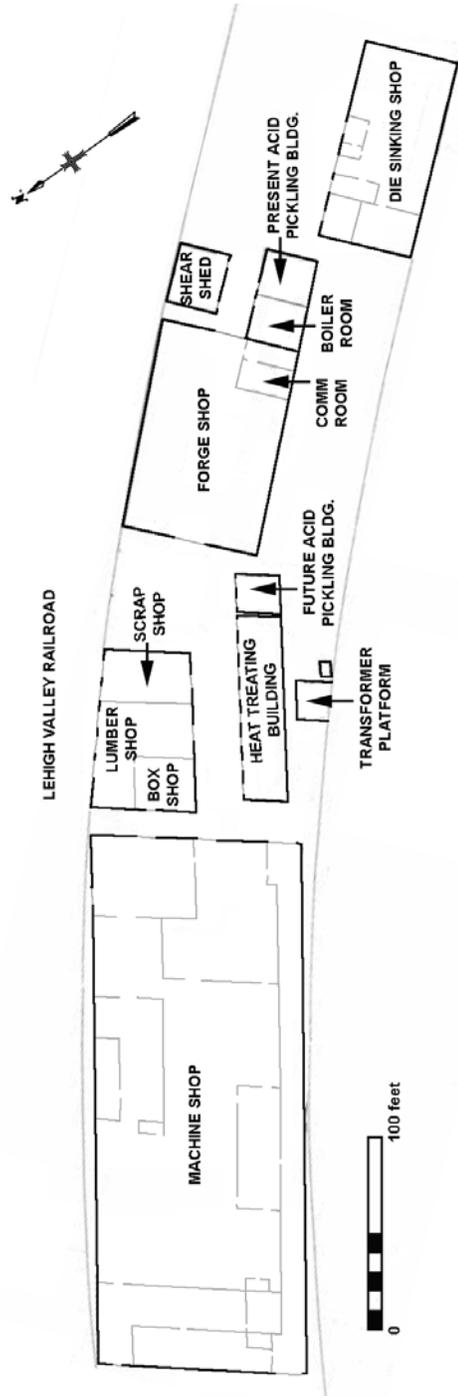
BUILDING 3 LOCATION AT FORMER SPICER MANUFACTURING CORP. PLANT
